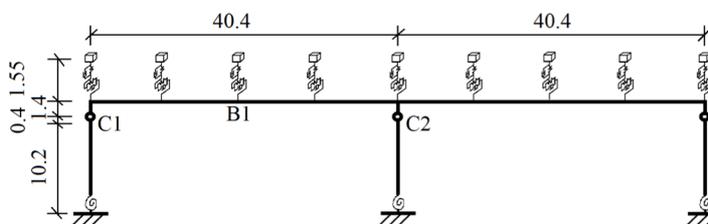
Bridge and vehicles model: C1, C2 and B1 are observation points. (unit: meter)
